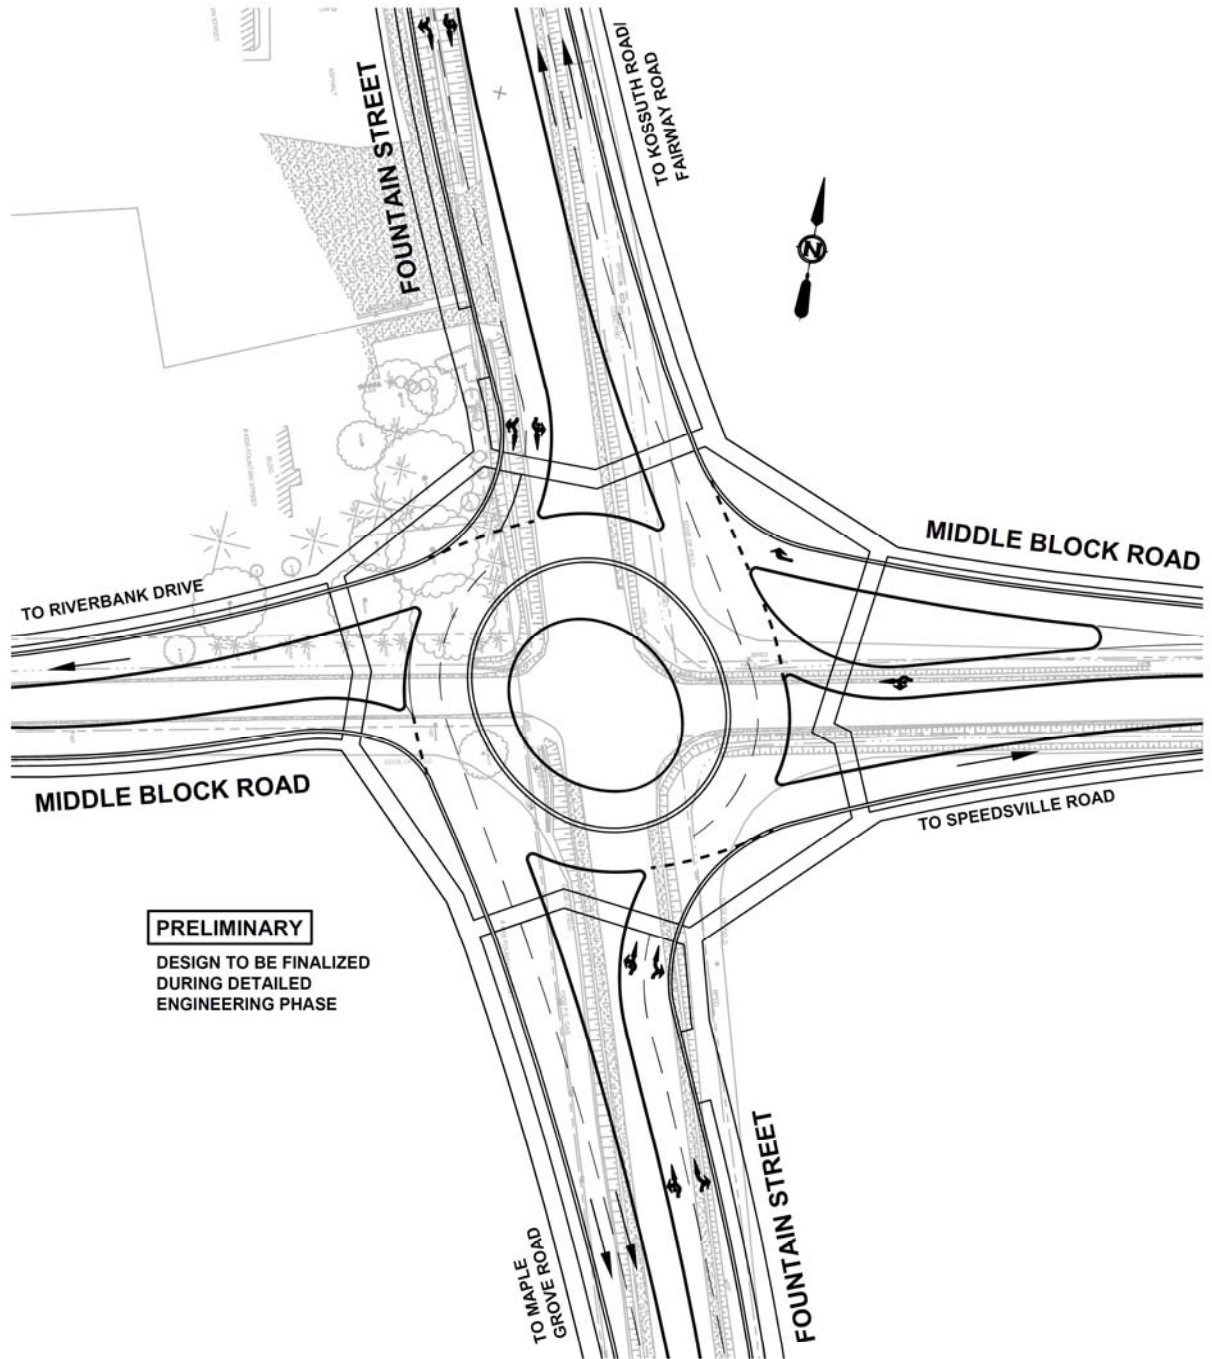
B Proposed Roundabout at Fountain Street and Middle Block Road (Interim 2-Lane Configuration)
